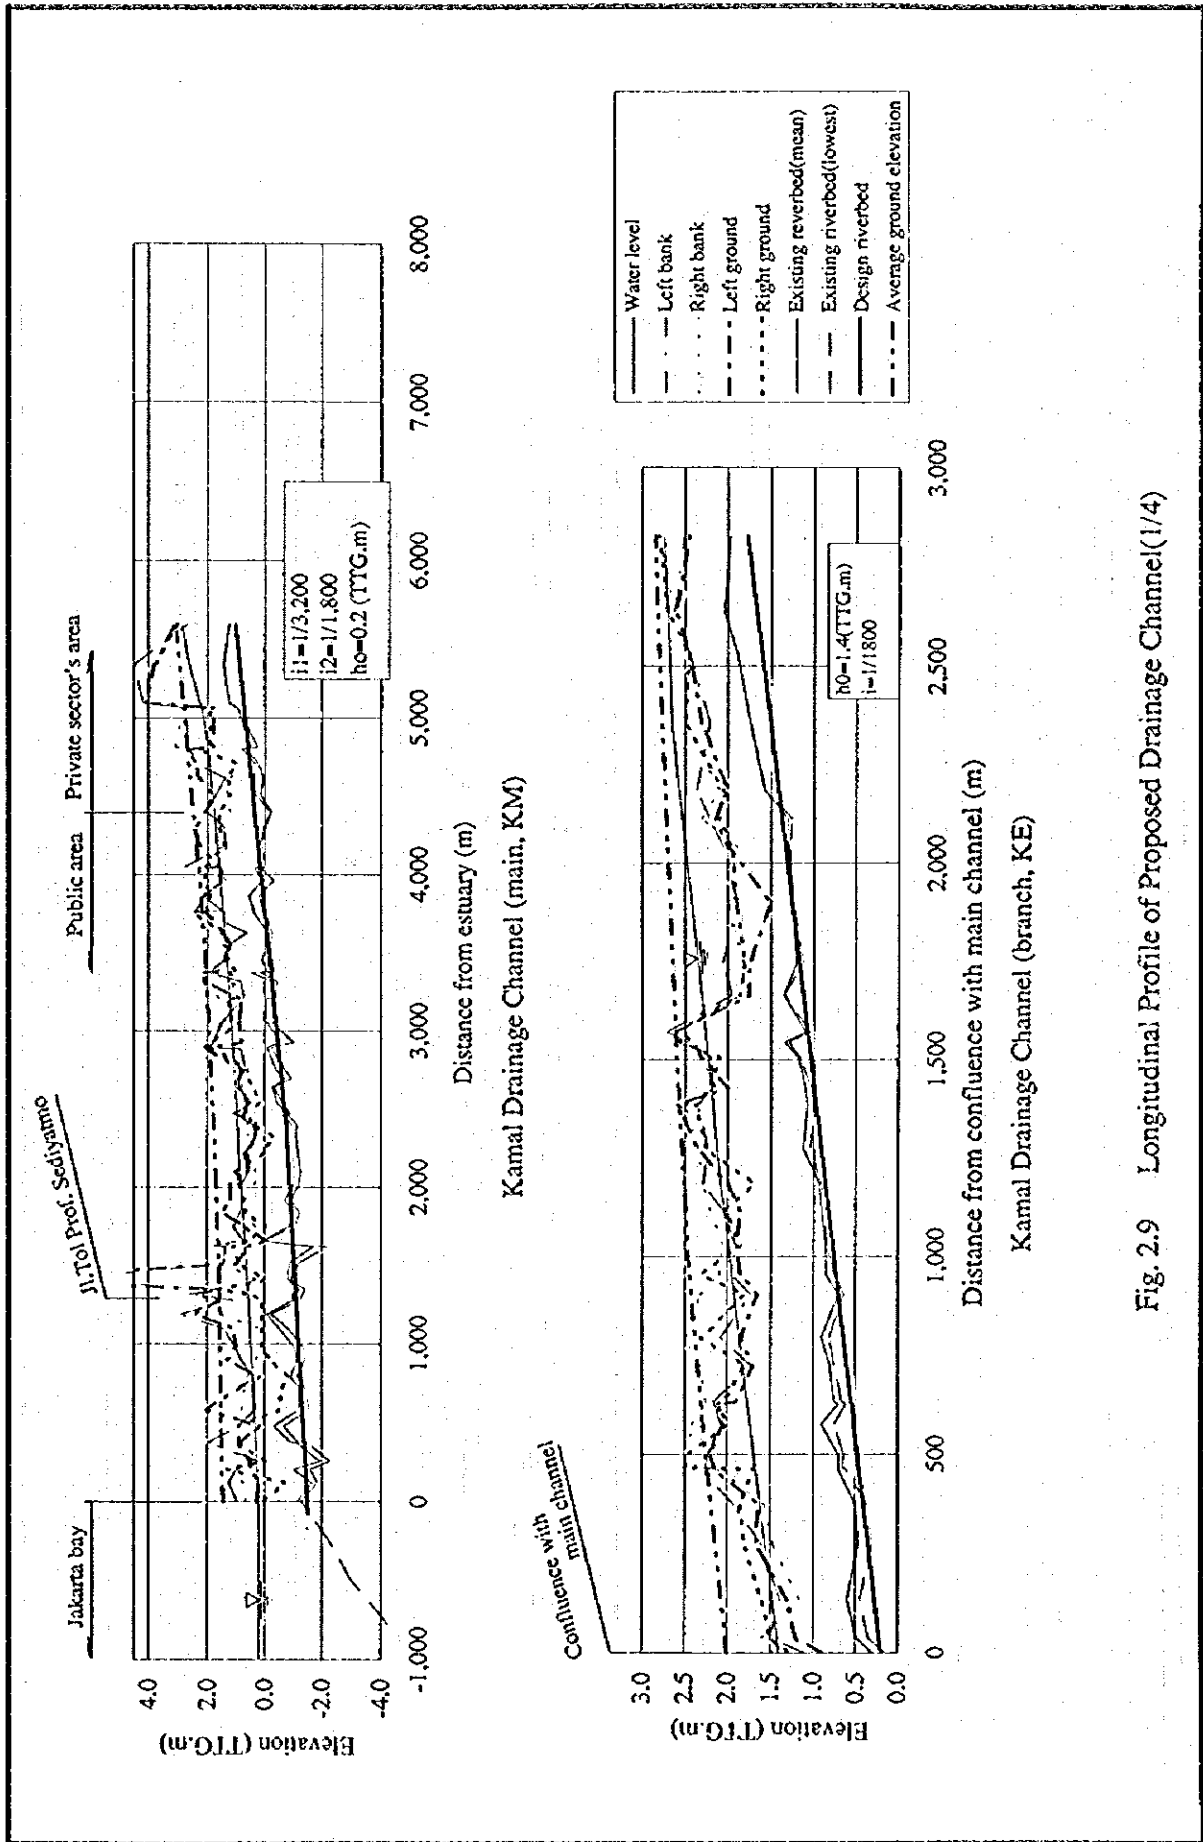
Longitudinal Profile of Proposed Drainage Channel(1/4)
